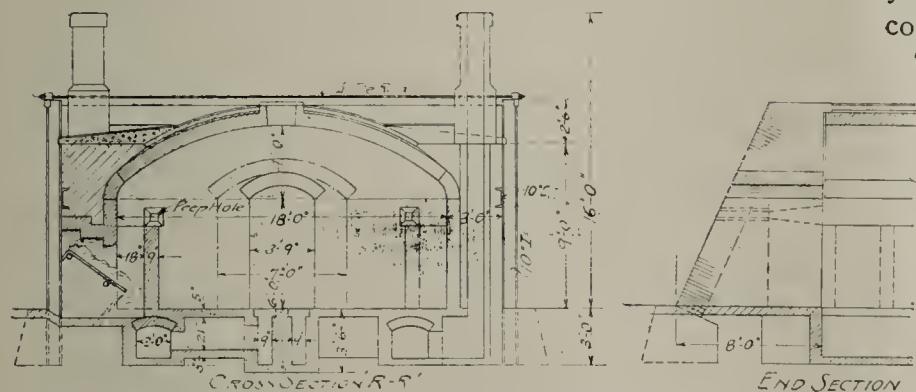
Rectangular Kiln Which May Be of Any Length and End Section Showing Retaining Walls Which May Be Used Instead of Buckstays and Tie Rods.
